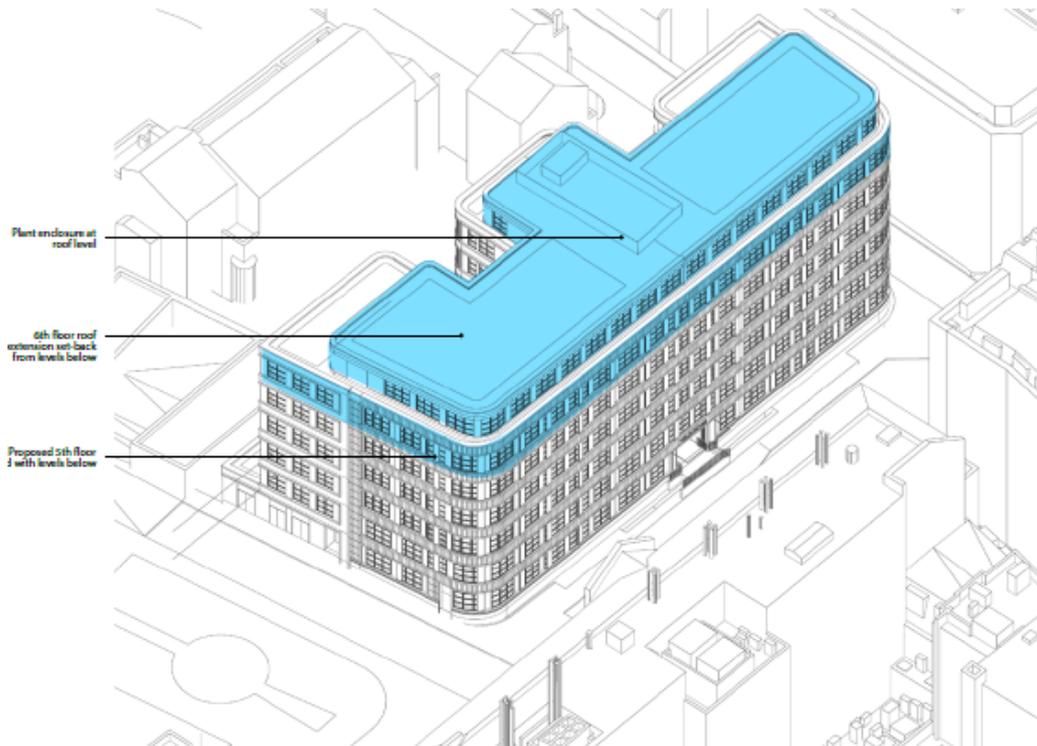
Shading in blue indicates additions to the building. view from southeast of front elevation and the Galway Street elevation.
